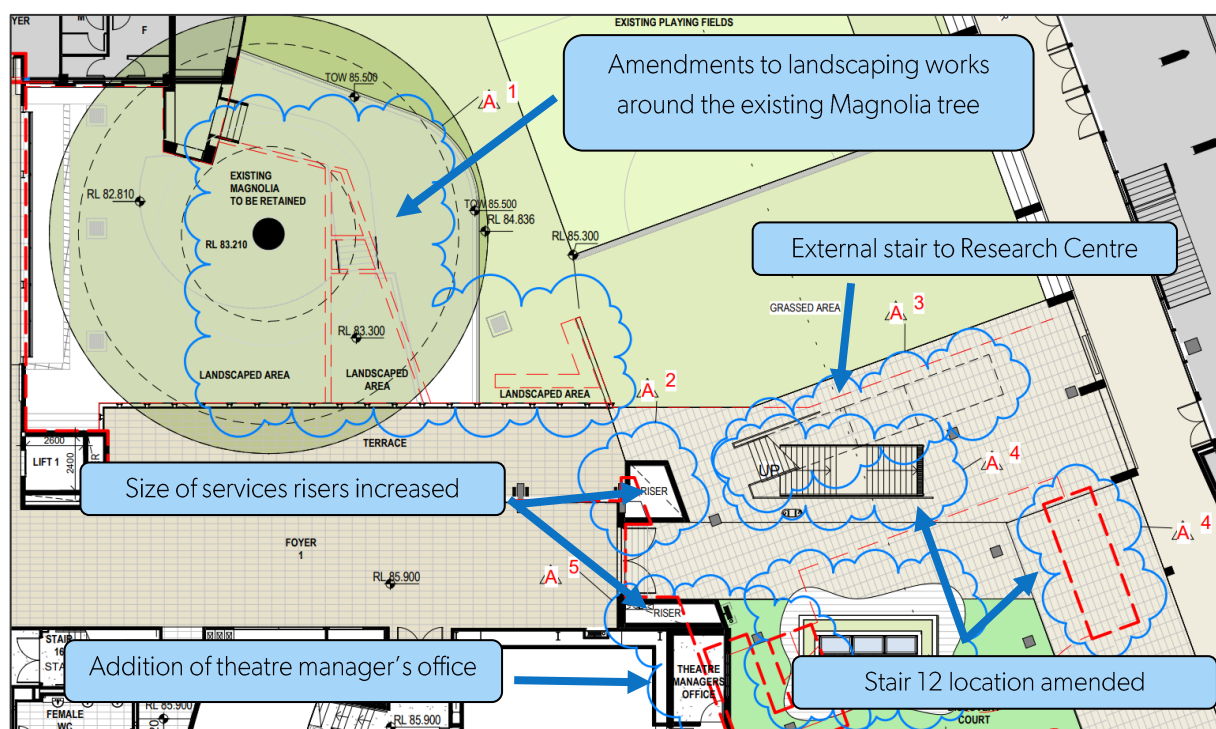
Proposed floor plan level 4 (MOD 2) (Source: Applicant's Modification Application 2019)
